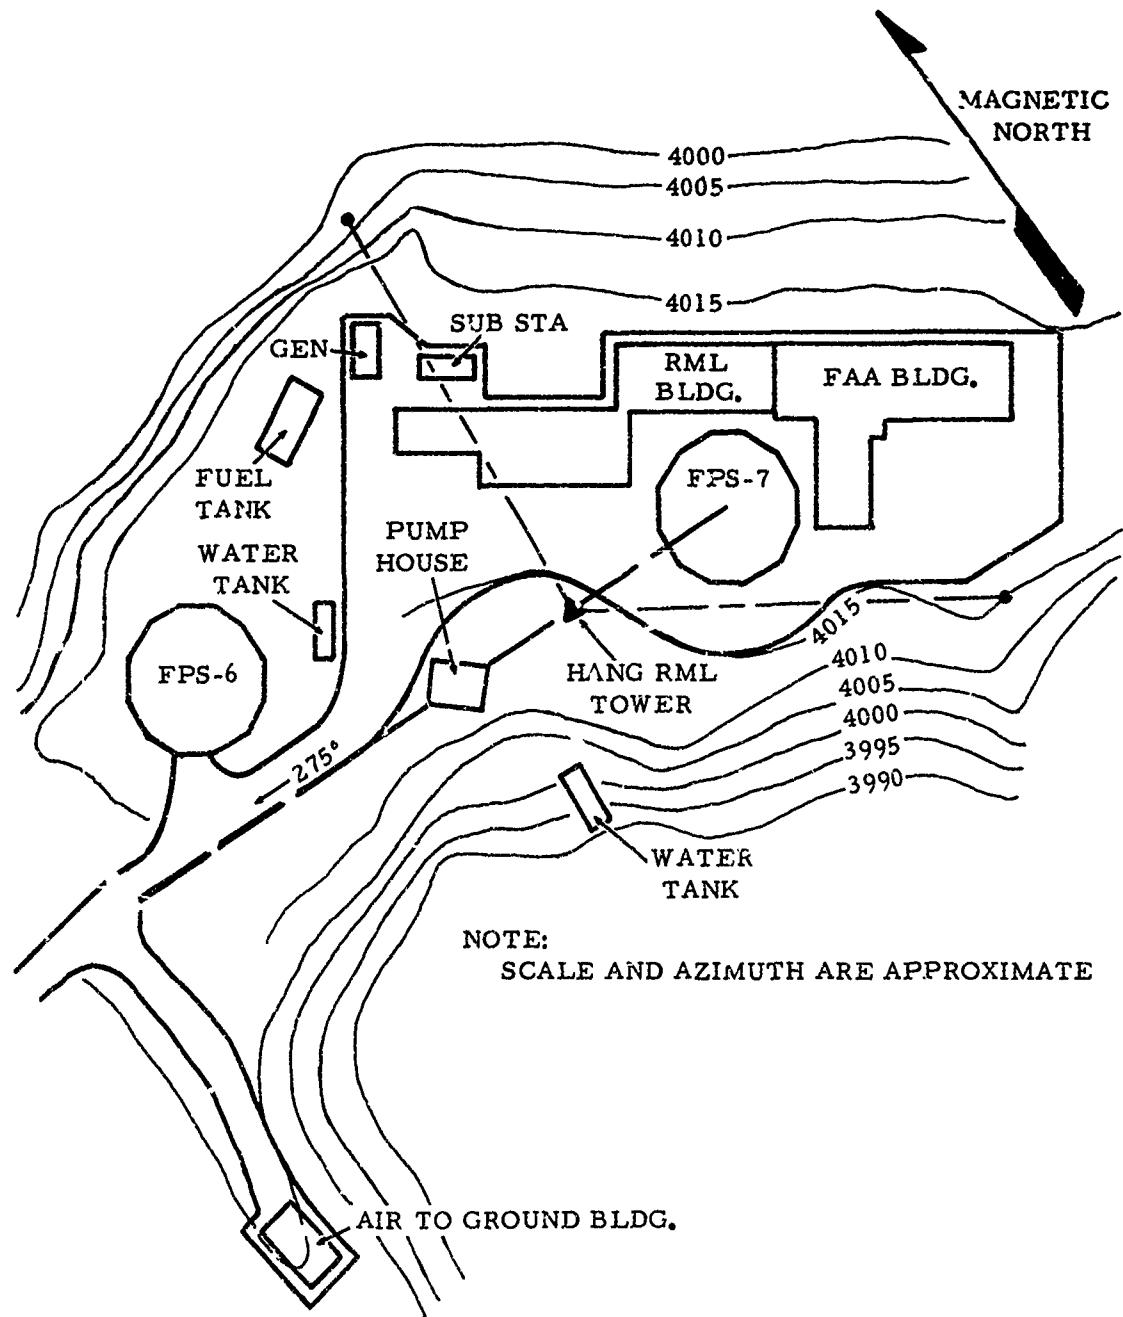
MOUNT KAALA SITE PLOT PLAN
